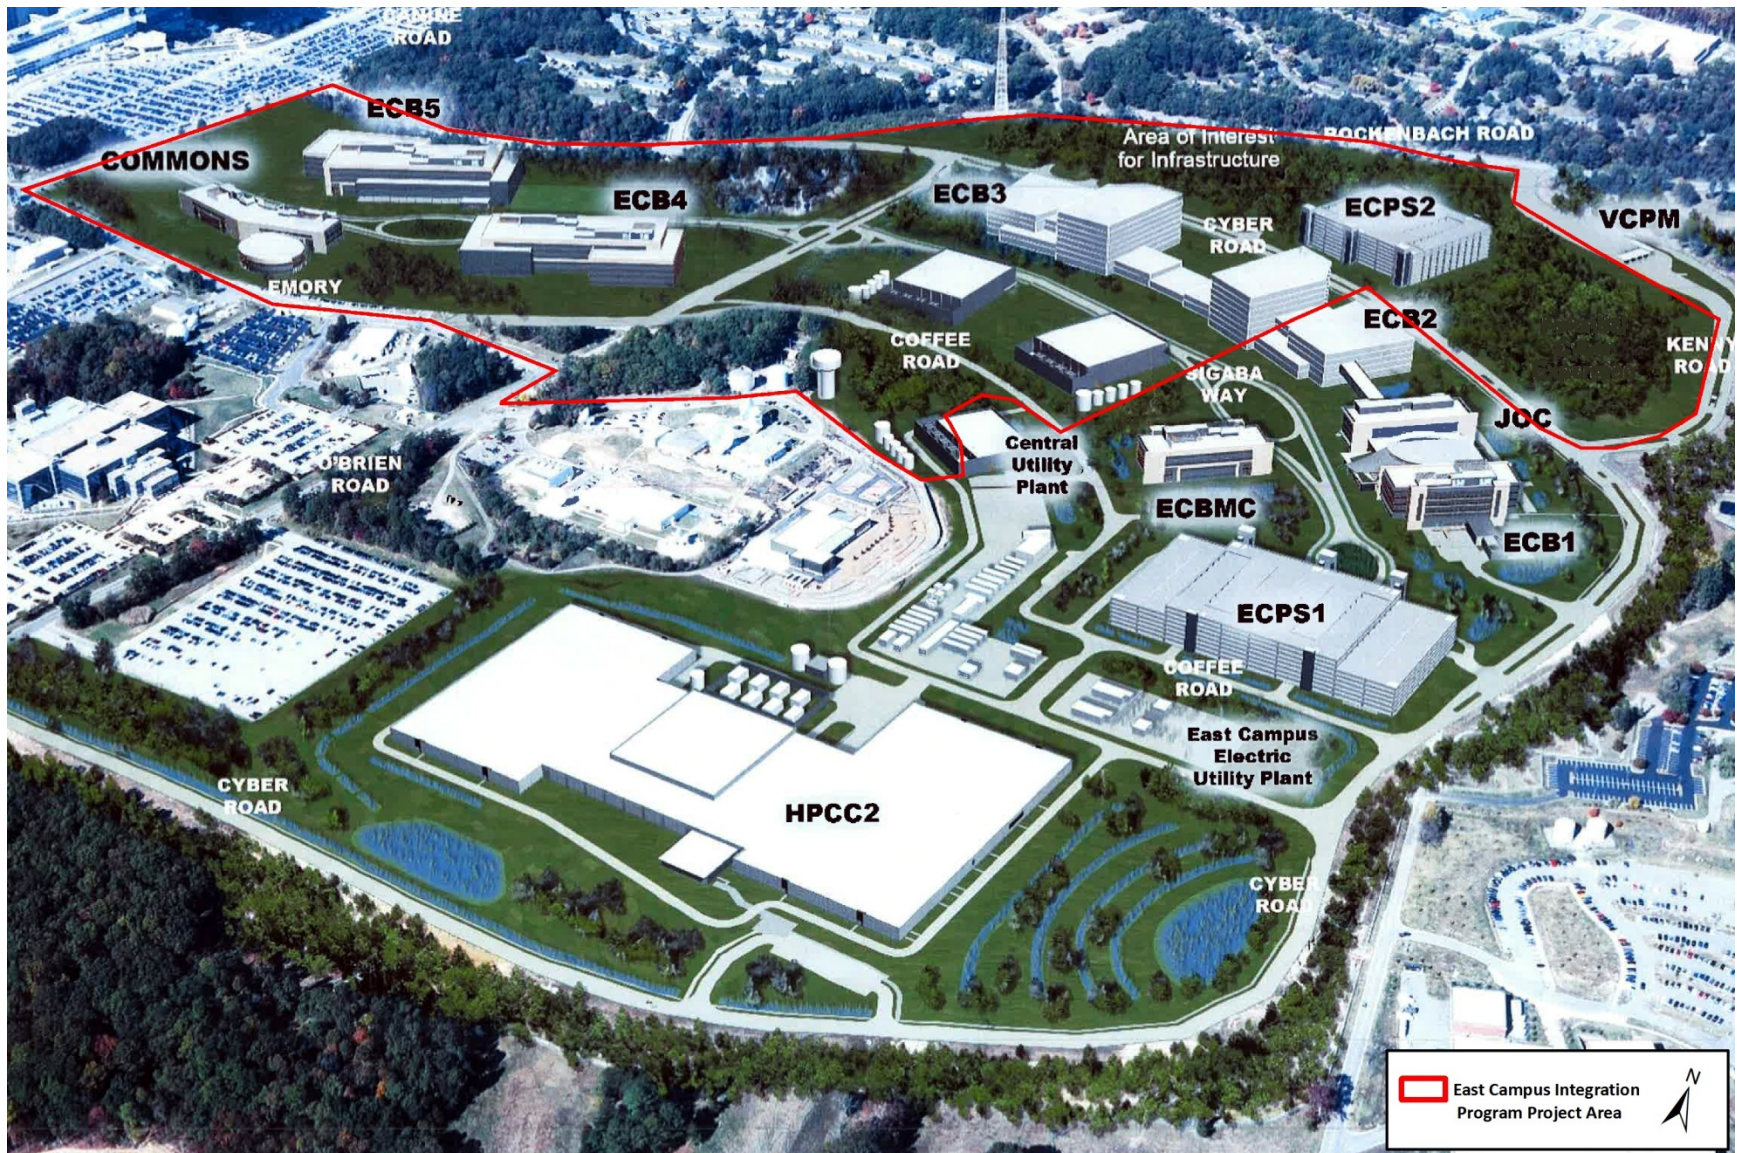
Potential Conceptual Site Layout of the Proposed Facilities
